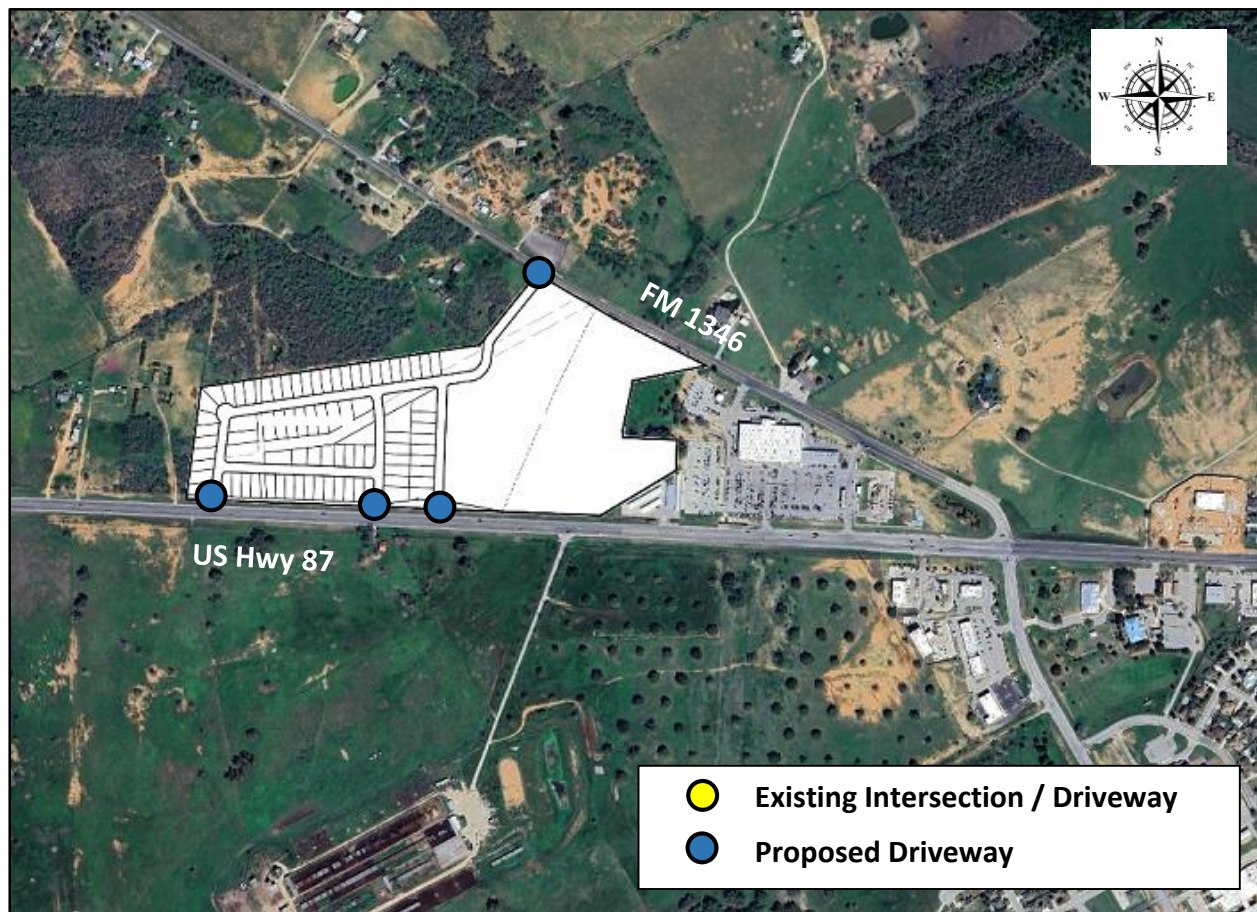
Existing and Proposed Access Driveways for the NP Homes
